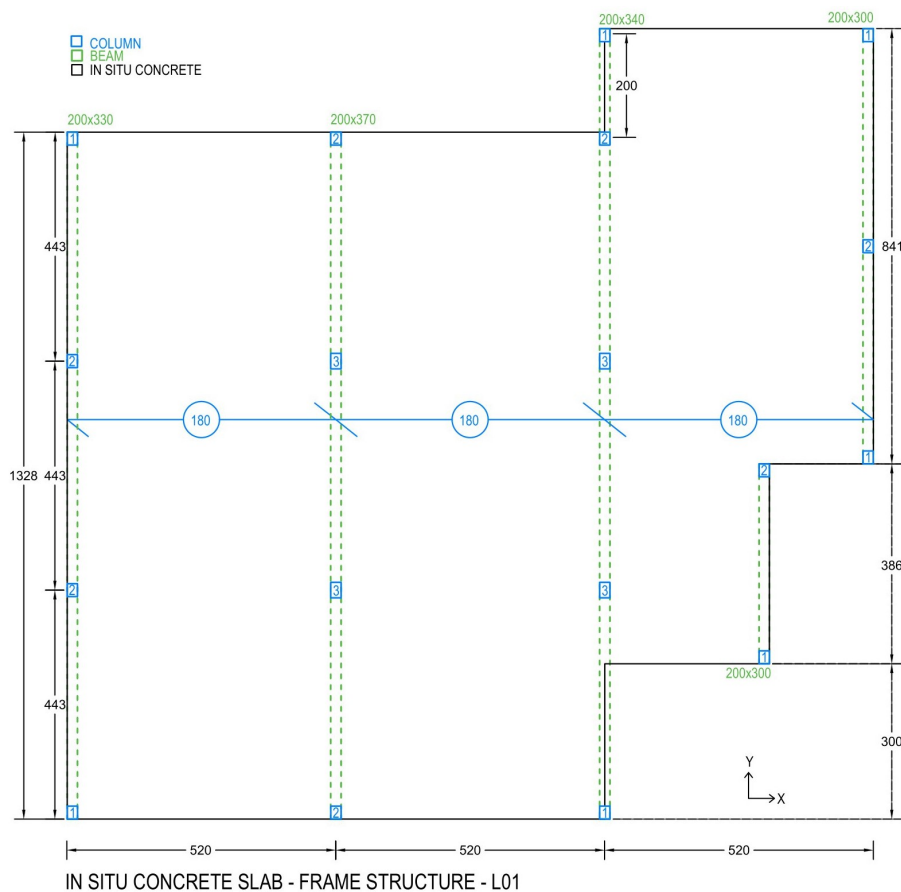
Conceptual structural design plan of the FU with an in situ concrete slab supported by a frame structure - L01
